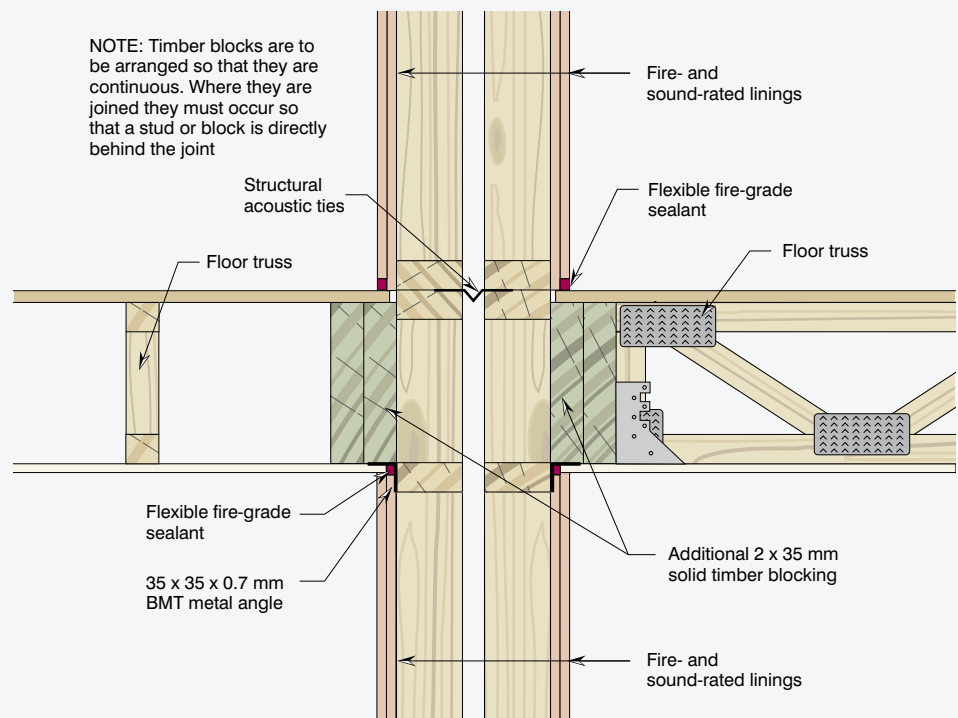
Joist parallel and perpendicular to the wall, wall stud continuous through junction – FRL 90 minutes only – elevation view.
